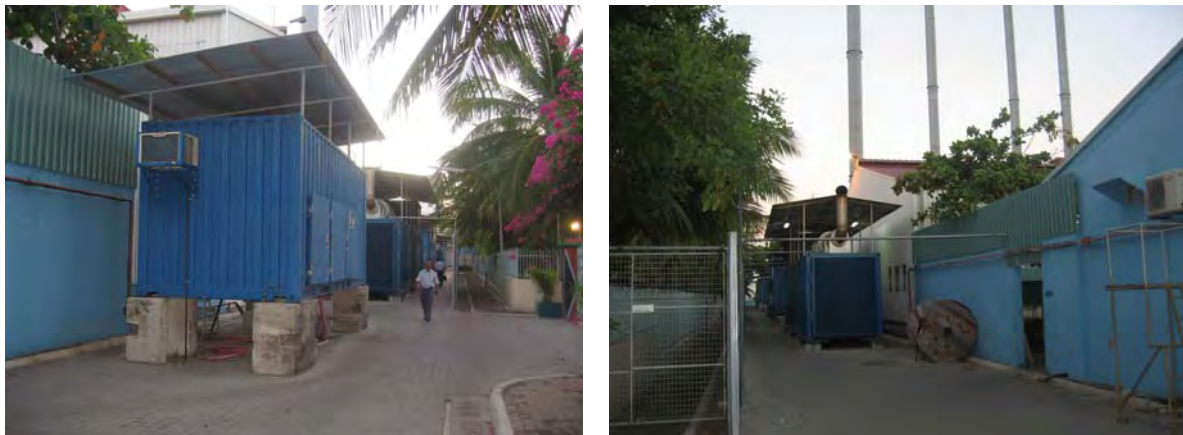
Diesel generating facilities installed on the public road adjoining the STELCO power plant
